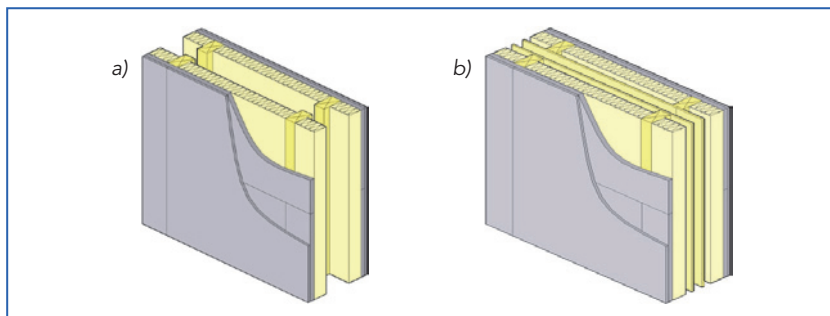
Examples of twin frame timber frame separating walls non sheathed (a) and sheathed (b). [[2] - (U.K.)].
